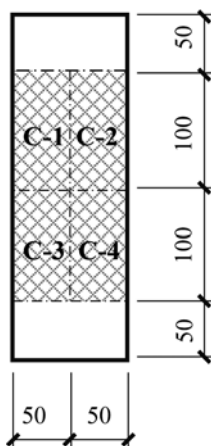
The cutting method for concrete specimen C-1~C-4 (Unit: mm).
